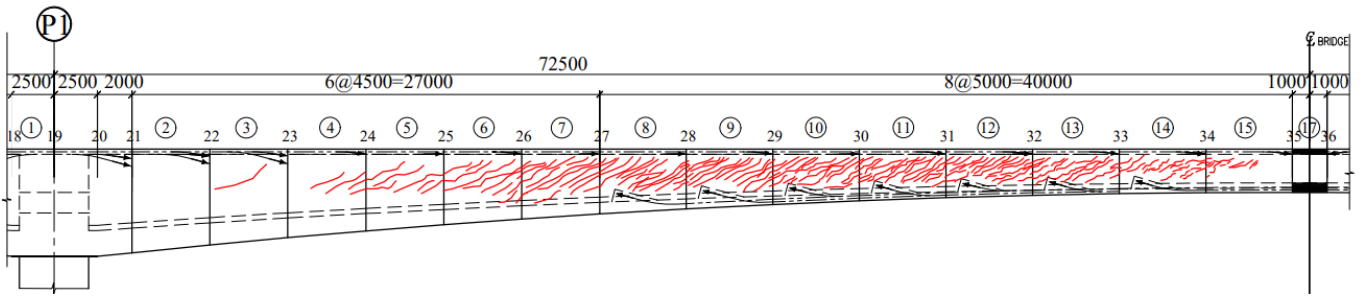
On Site Web Box Girder Crack Pattern Mapping.
